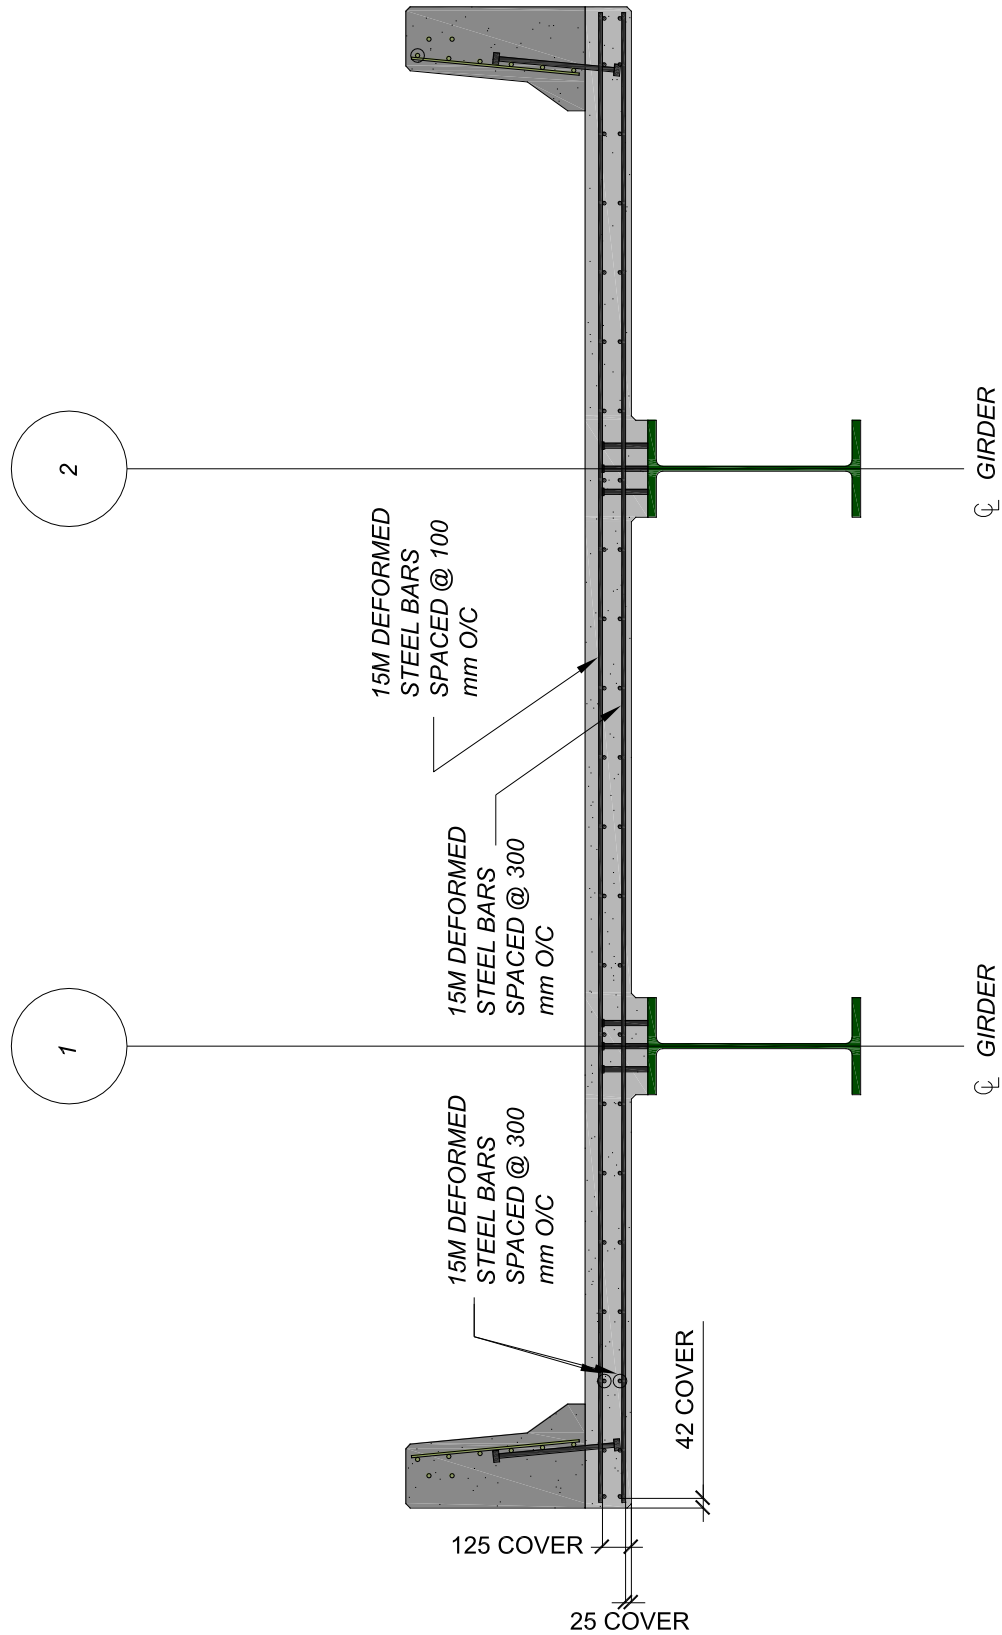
Cross section view of Segment A: Conventional steel reinforced concrete bridge deck slab
